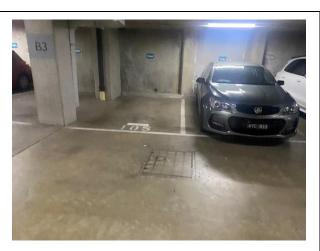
B3, adjacent parking bay 105, unknown underground pit
